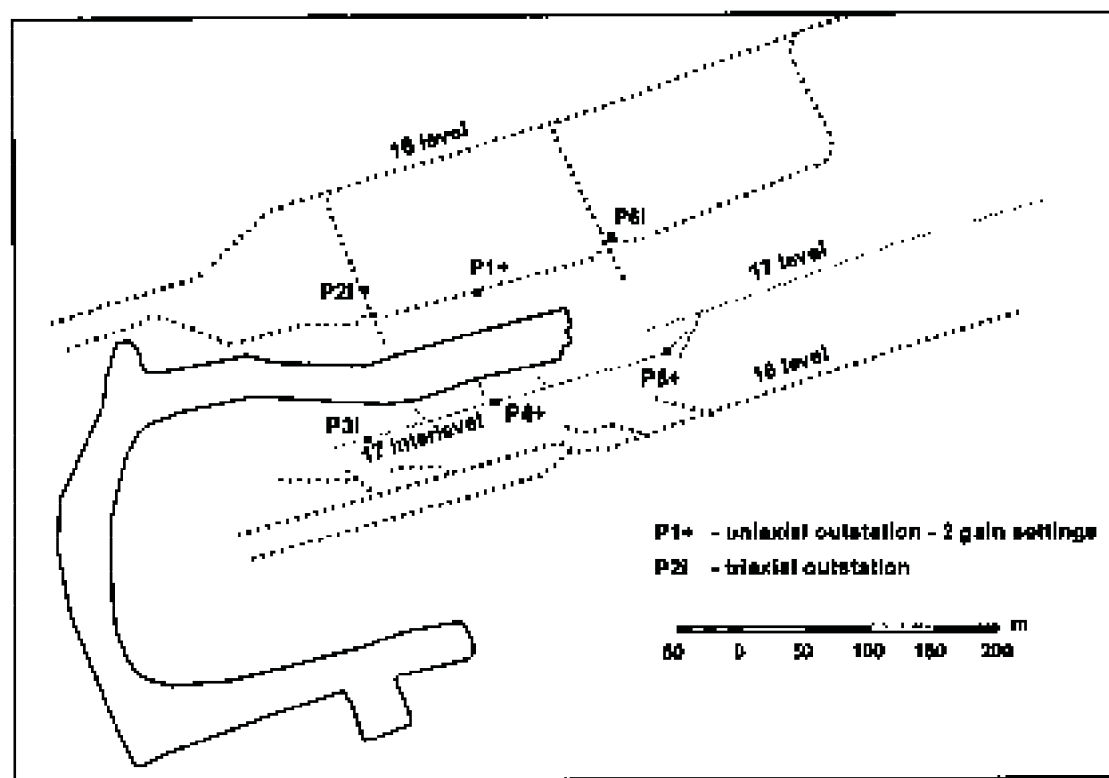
Plan of 17-24W stope (test site) and layout of the microseismic network around the mining faces
